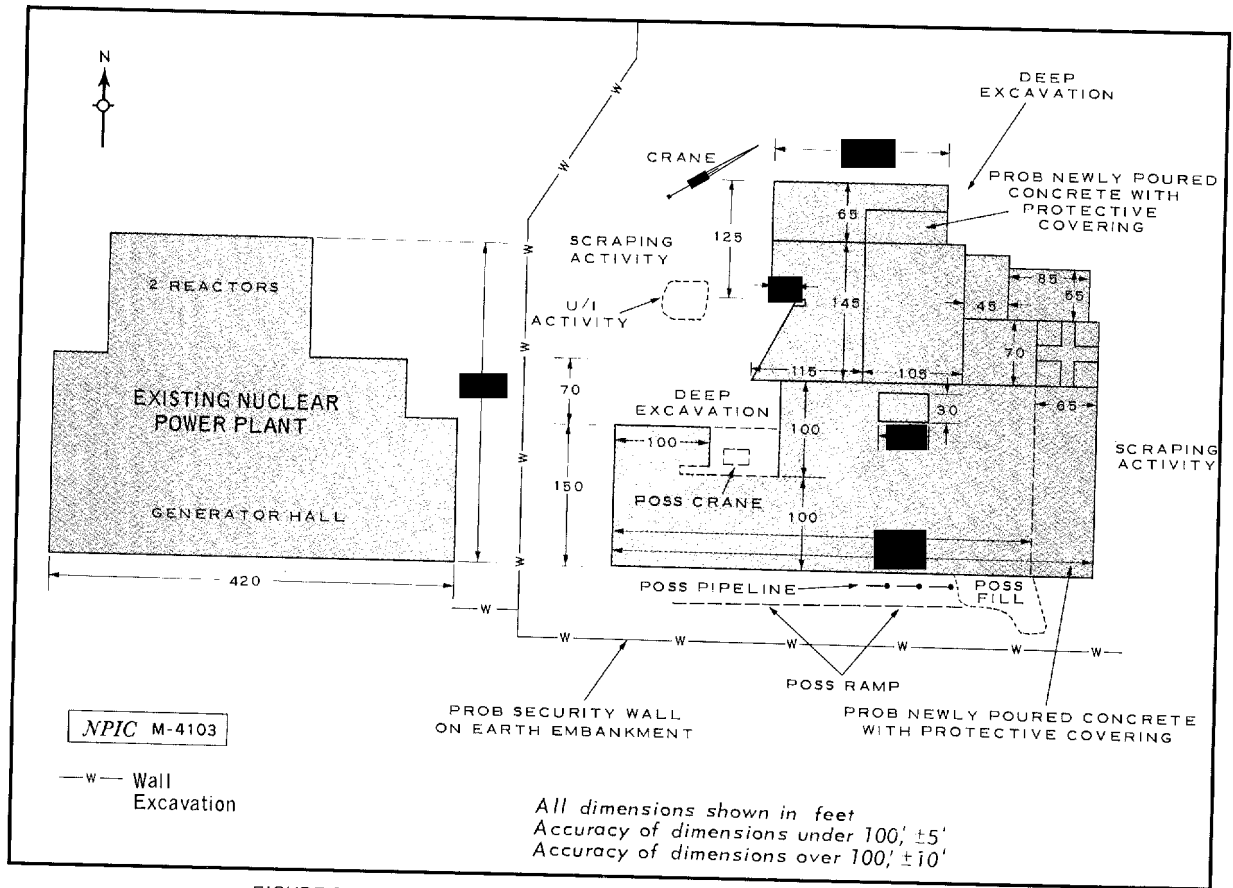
PLAN VIEWS OF EXISTING AND NEW POWER PLANT BUILDINGS.
